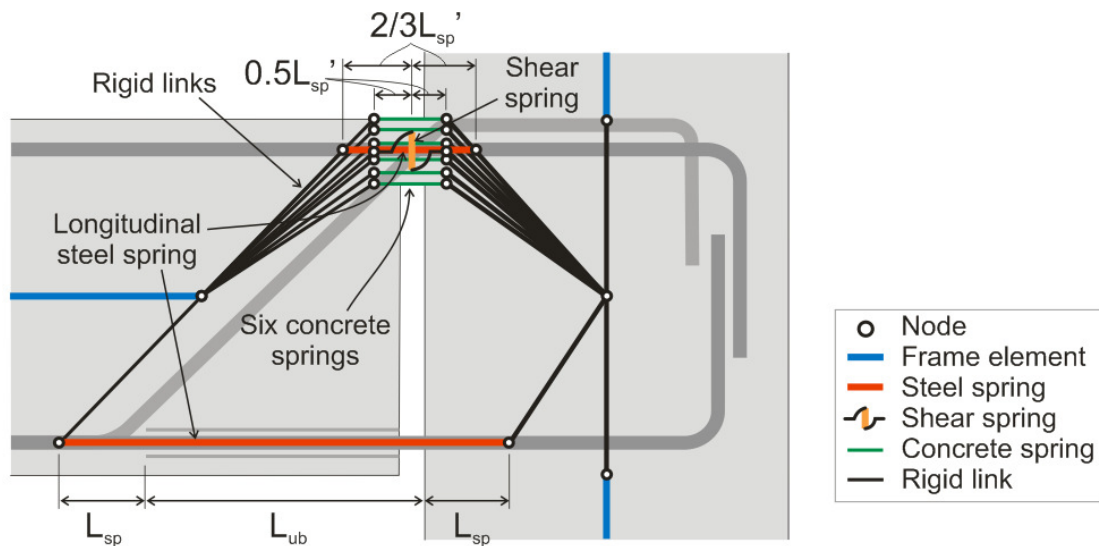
Multi-spring model for slotted reinforced concrete beam connections
